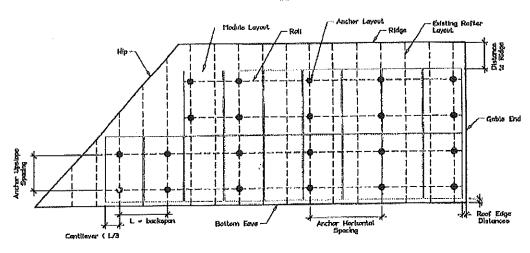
Sample Solar Panel Array and Anchor Layout Diagram (Roof Plan).
